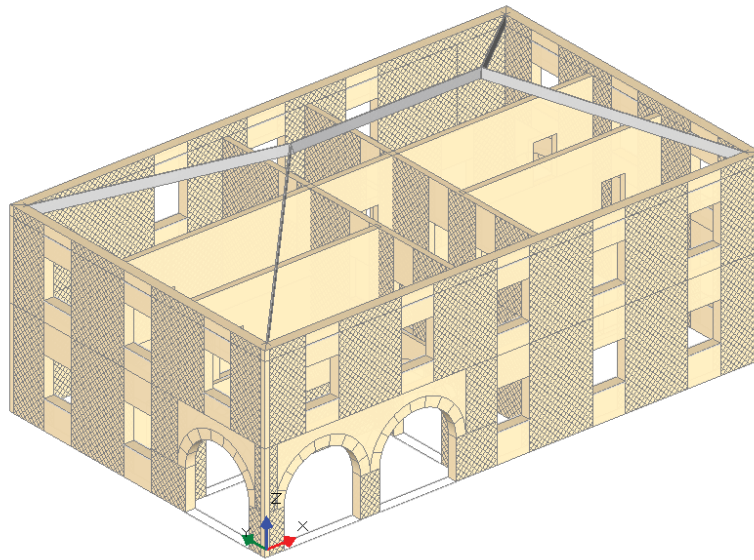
Application of reinforced mortar coating on perimetral and internal walls
